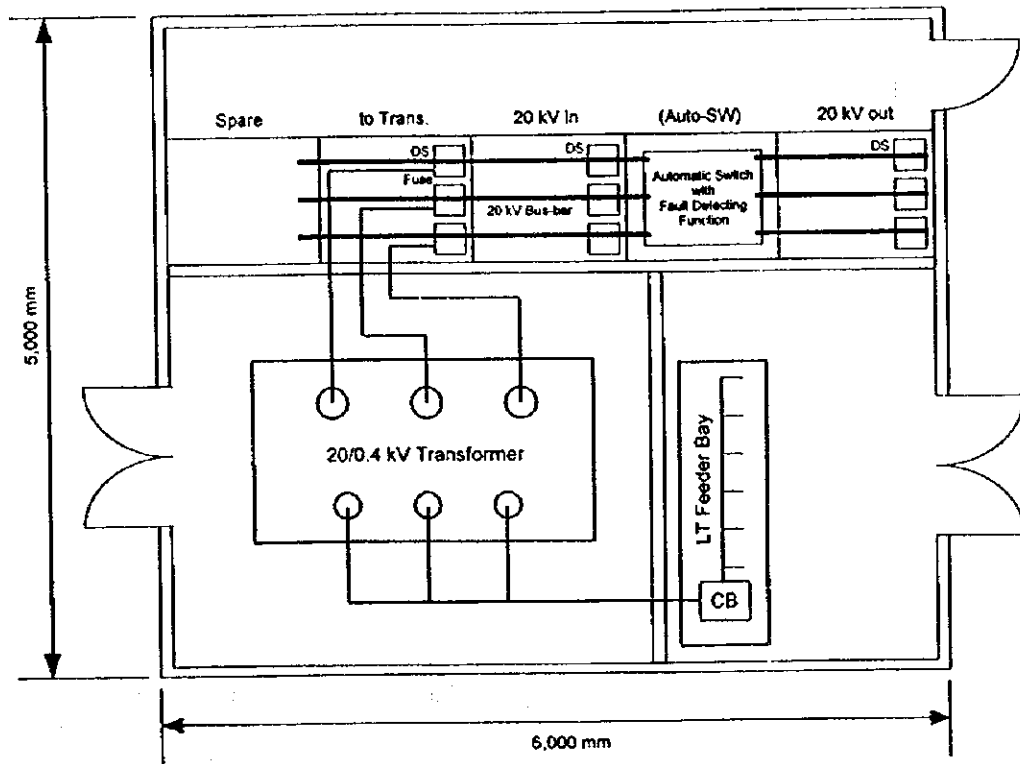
Typical Layout of Ground Mounted 20/0.4 kV Transformer
